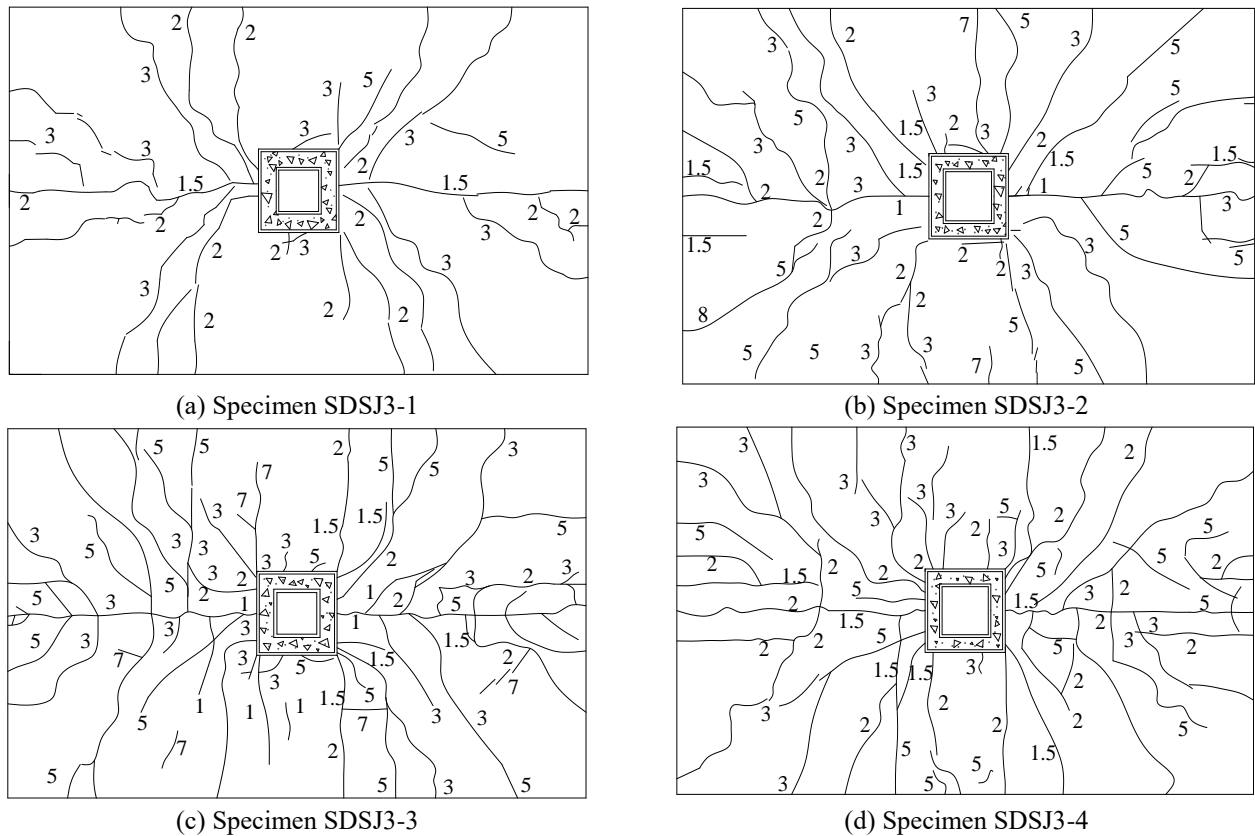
Crack pattern of SBTD concrete slabs
